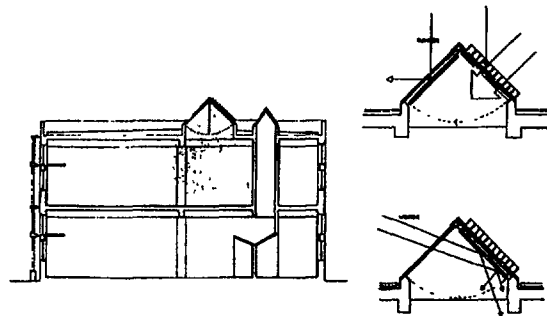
Cross elevation showing two classrooms and roof light operation detail
